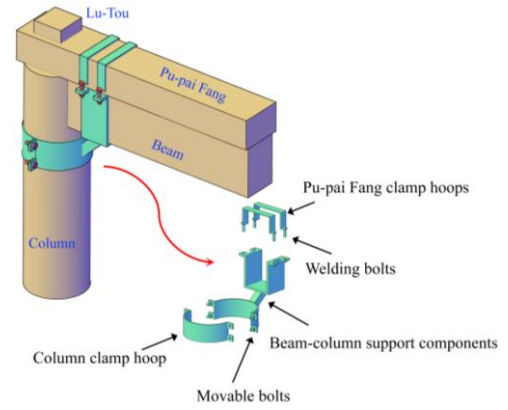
Steel sleeve clamp hoops reinforce the Pu-pai Fang - dovetail tenon joint design
